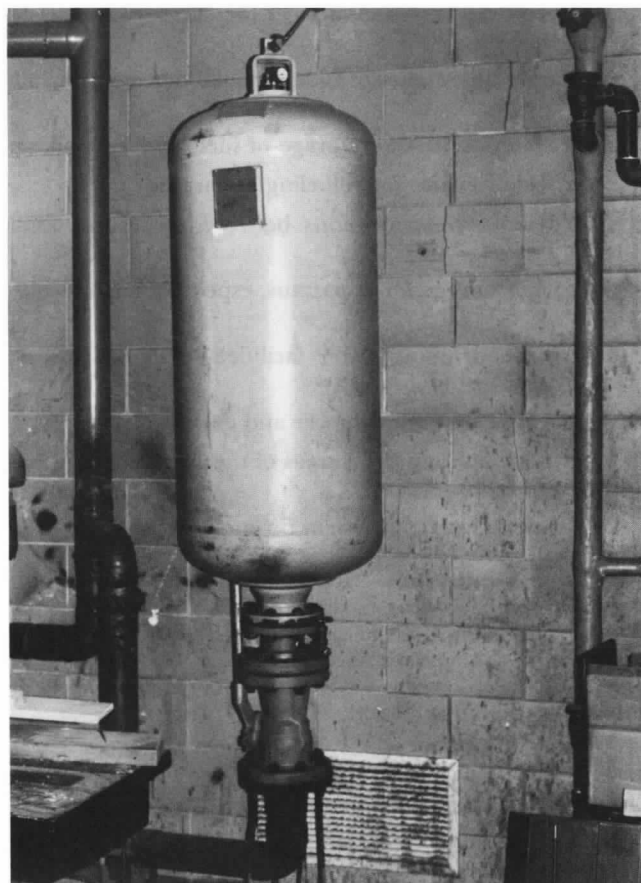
(a) Bolted and steel-rod-jointed joints under compensator. New York Fire Department Academy, New York, New York.
